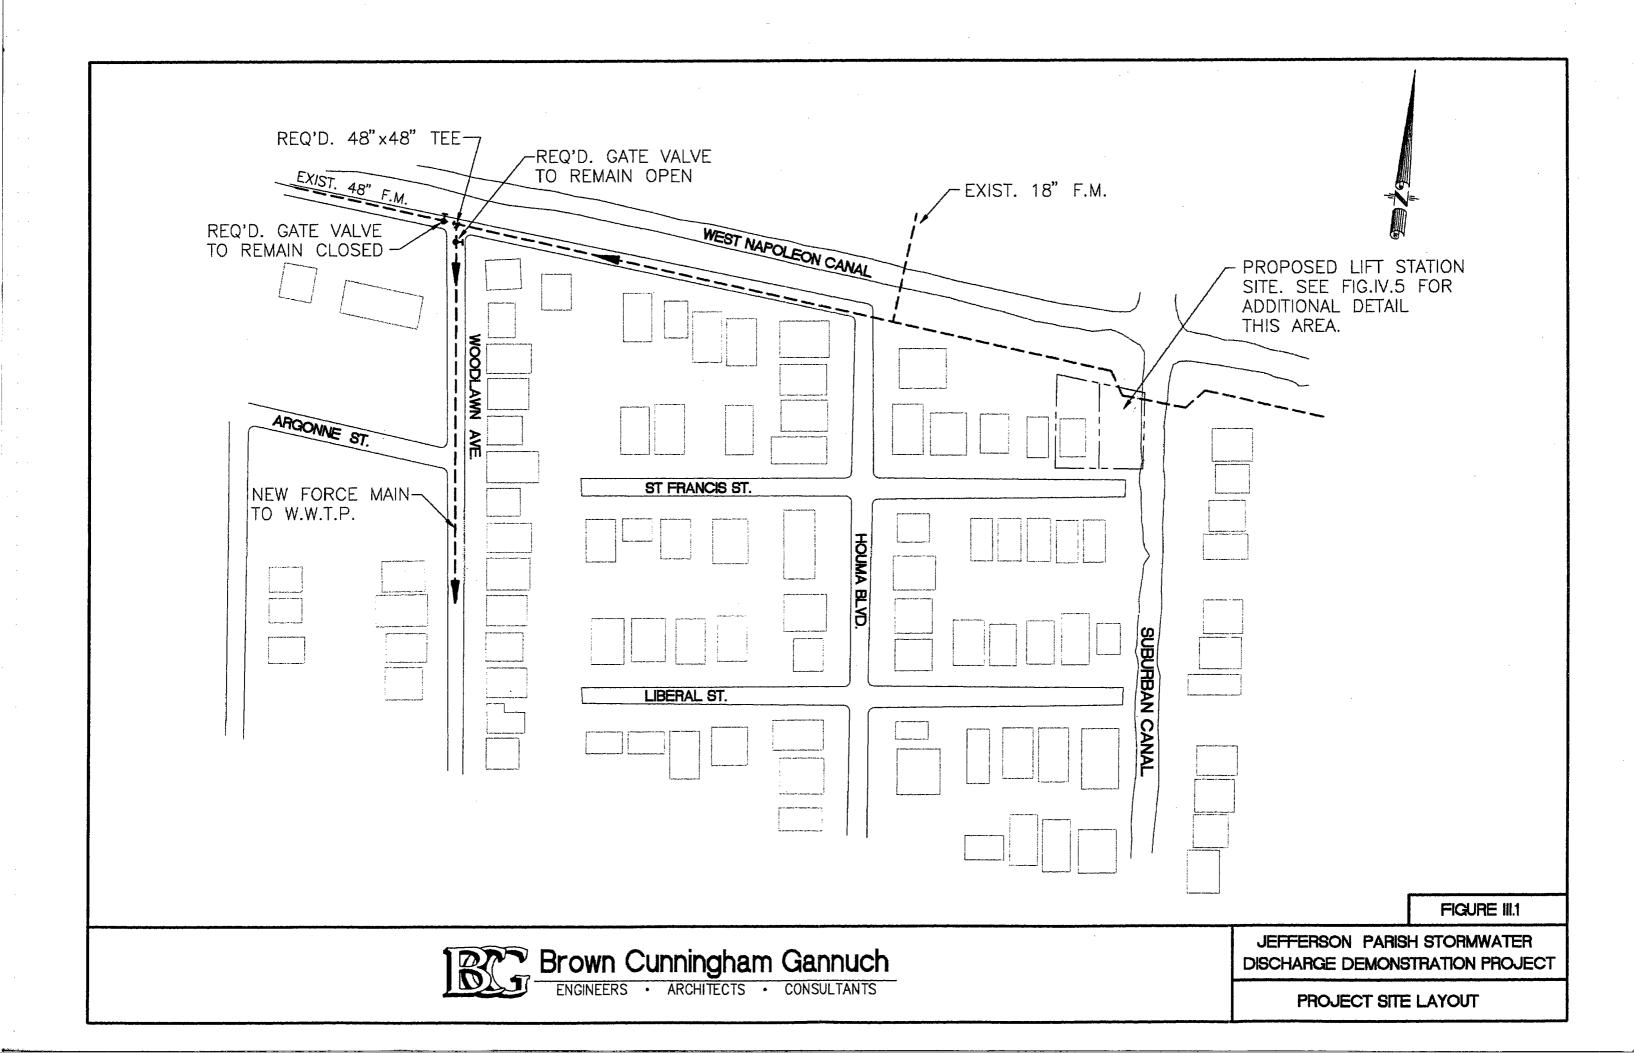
provides an illustration of the proposed force main layout with respect to the proposed lift station location. The subject is discussed in greater detail in Section IV-B.
